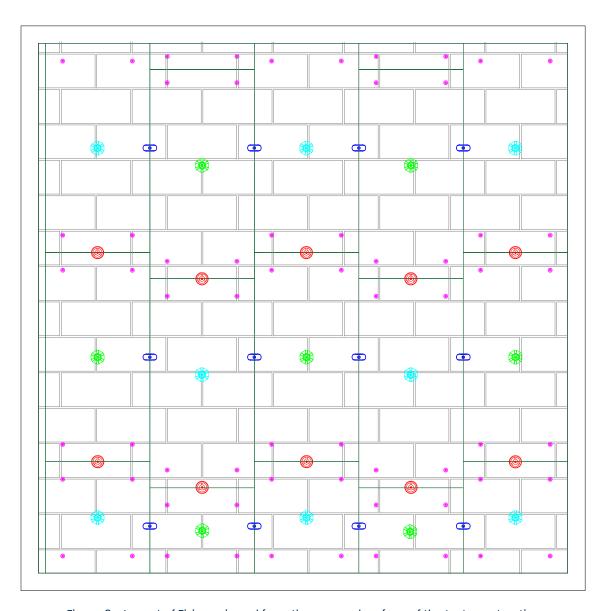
Layout of Fixings viewed from the exposed surface of the test construction
